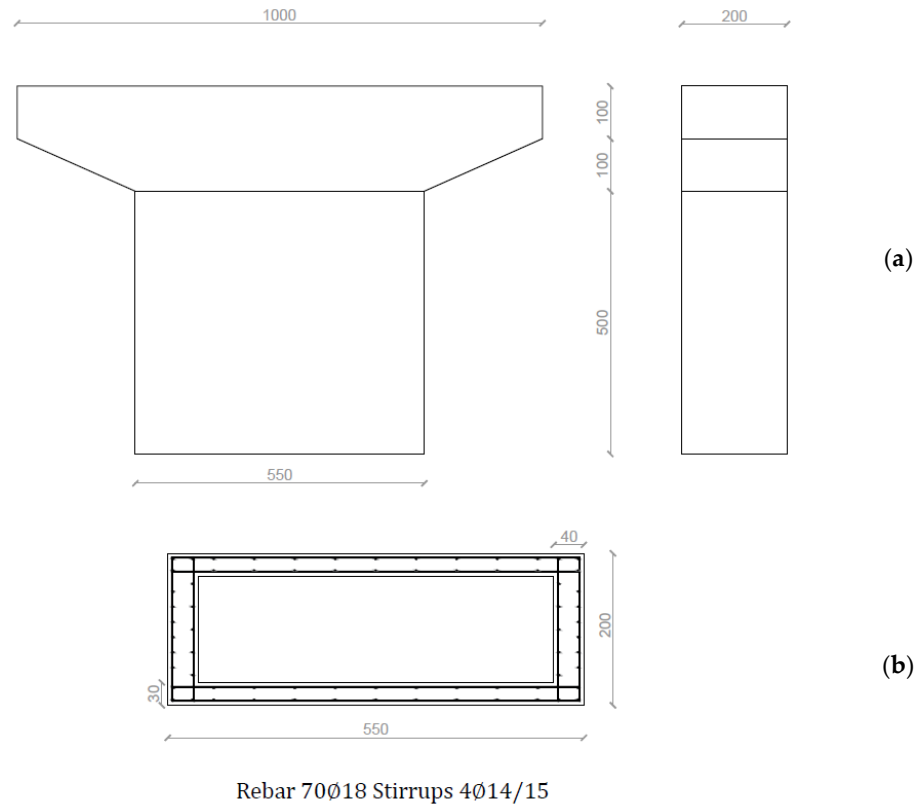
Hollow rectangular cross-section pier: (a) elevation view; (b) cross-section with details of the reinforcement. Dimensions in cm.
